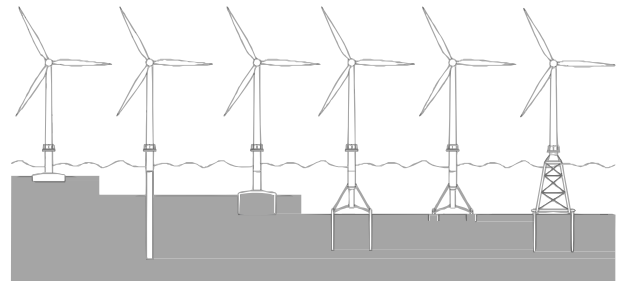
Common substructures and foundations, adapted from Kallehave et al. (2015). From left to right: gravity-based, monopile, monocaisson, tripods and piled jacket.
